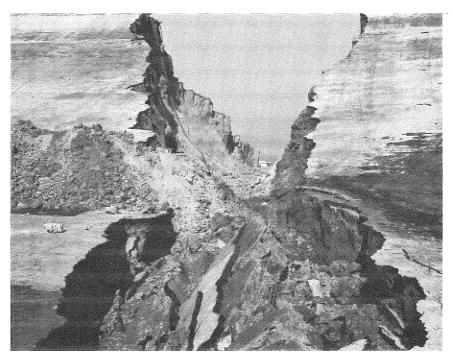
Breach seen from inside reservoir, December 22, 1963.
